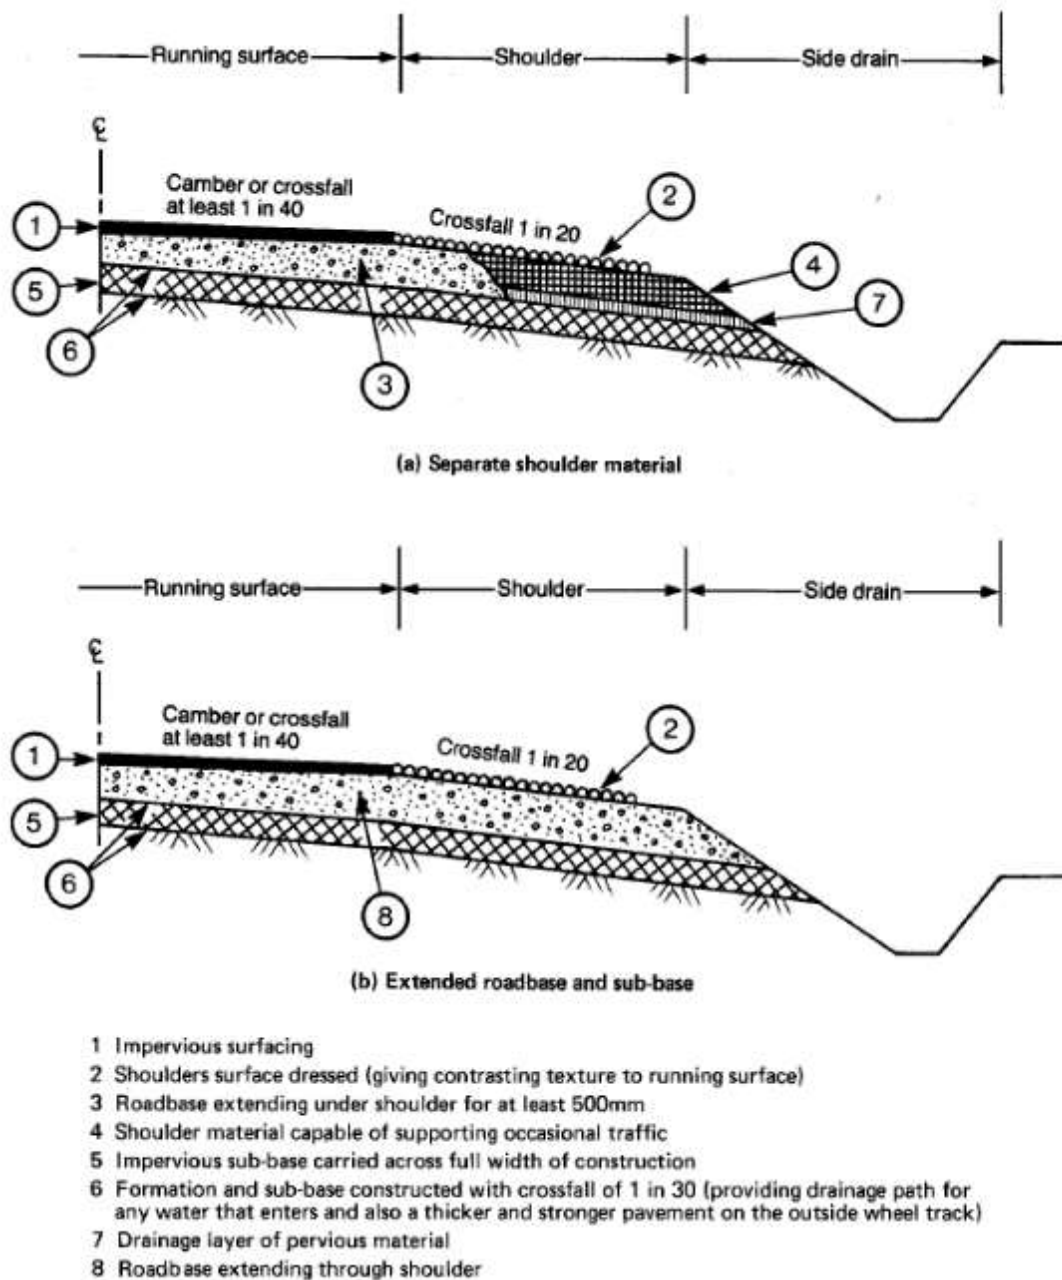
Cross section of road showing shoulder arrangement and roadside ditch
